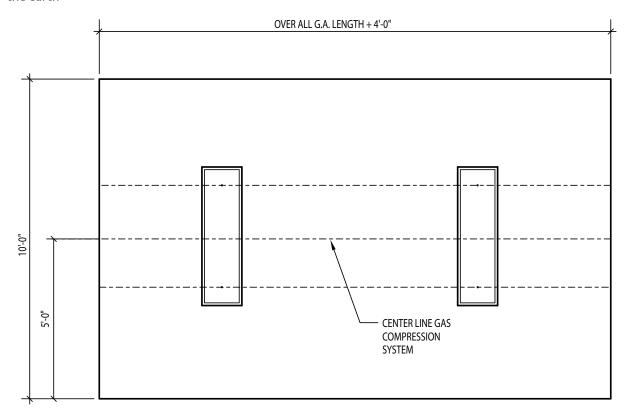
Foundation with Housekeeping Pads Dimensions - Top View
